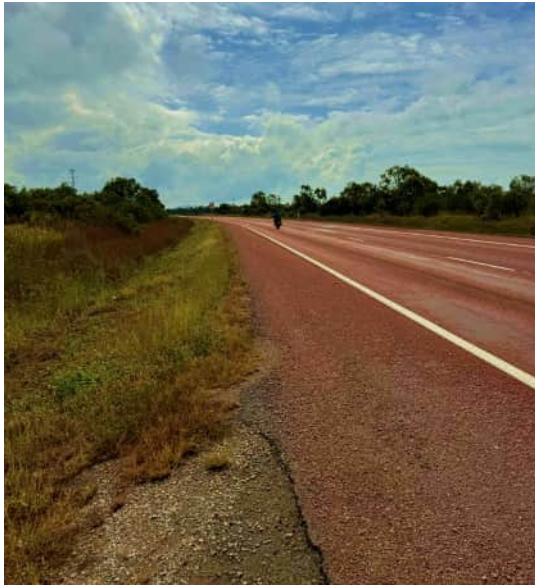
Townsville Port Access Road / Access 1 intersection – looking north
